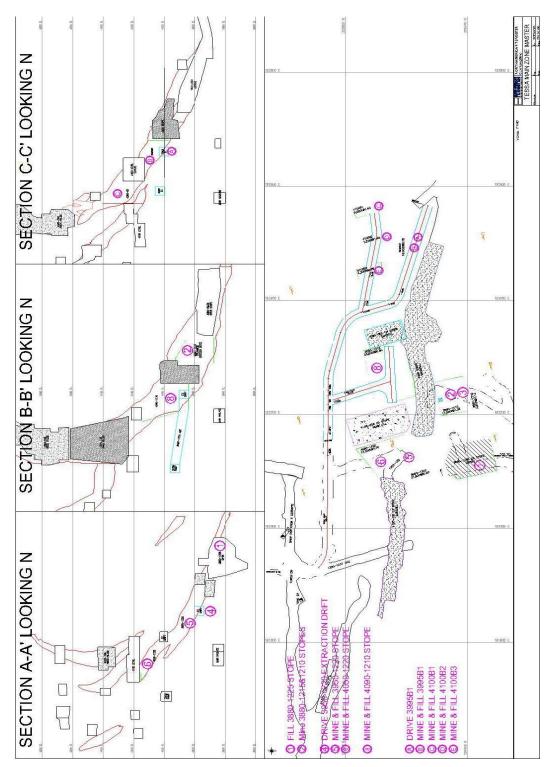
SALVAGE MAIN ZONE MINE PLAN
